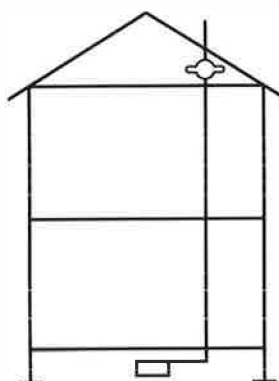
Pipework ducted internally, with the fan outlet through the roof and *not* ventilated into the roof space
